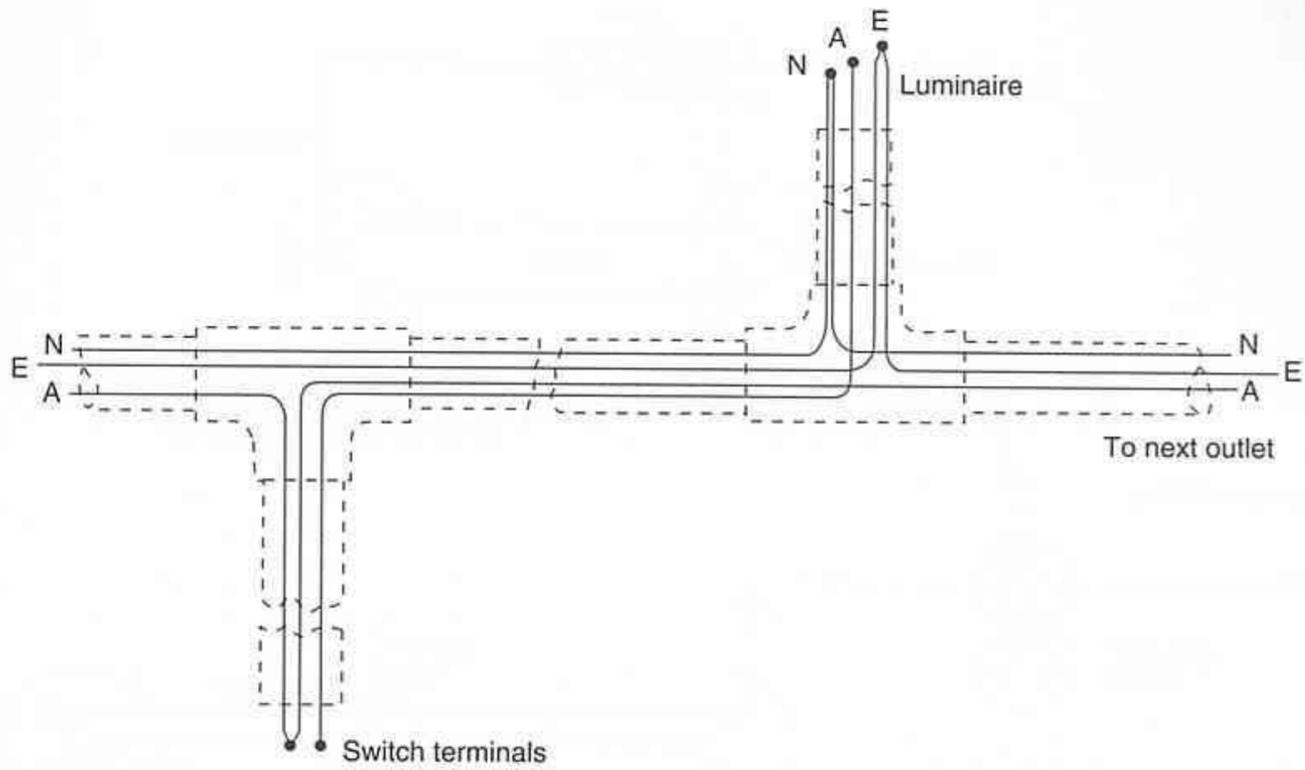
In this surface conduit system, actives are looped at the switch and neutrals or earths at the outlet or luminaire
